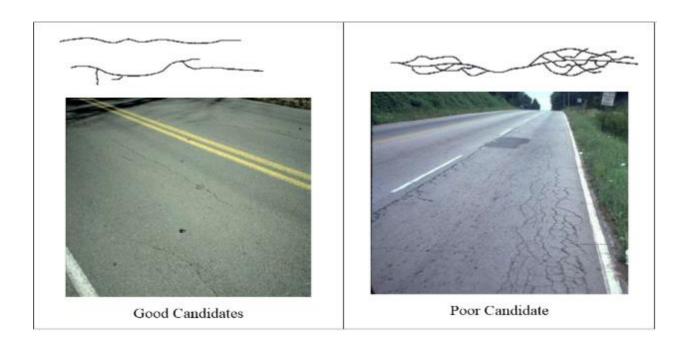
Photo. Cracking Characteristics of Good and Poor Candidates (Decker, 2014; GDOT, 2007)
